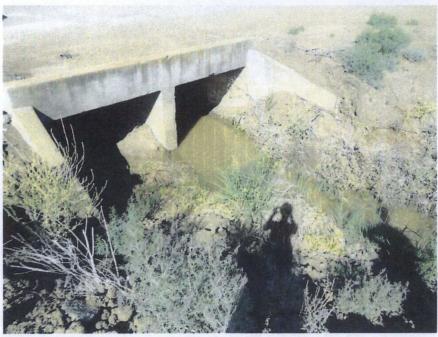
Pickup ditch culvert, sediment build-up (near Airstrip)
